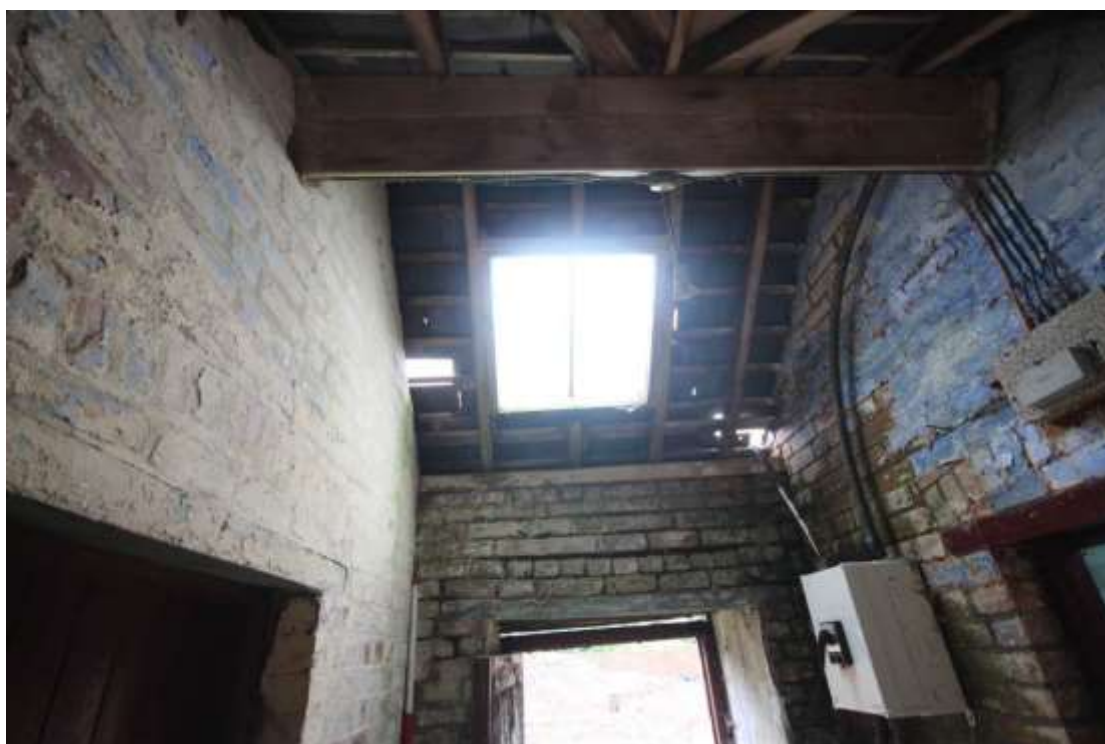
General view of the roof structure in the central corridor of the Potting Shed, facing south.
